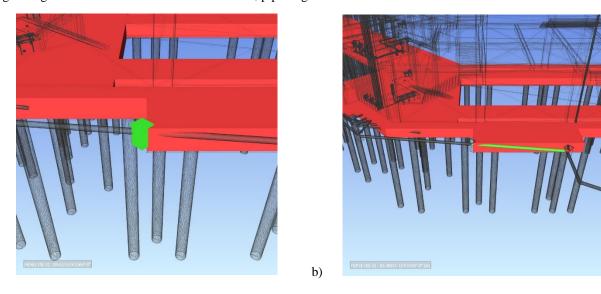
Clash Detection 3D View, a. Clash of Foundation slab with plumbing fixture, b. Clash of Foundation slab with pipe.
